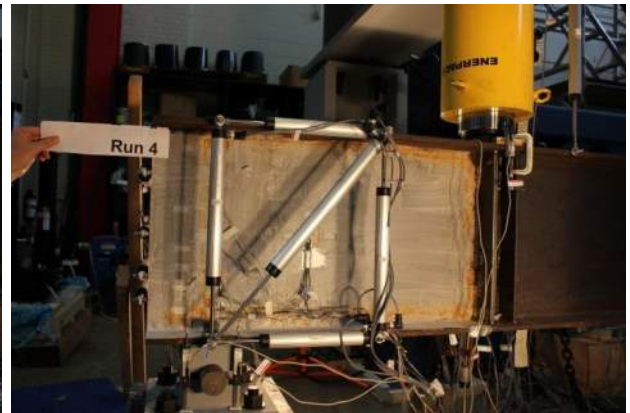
Undamaged Girder Right: 100 kip
